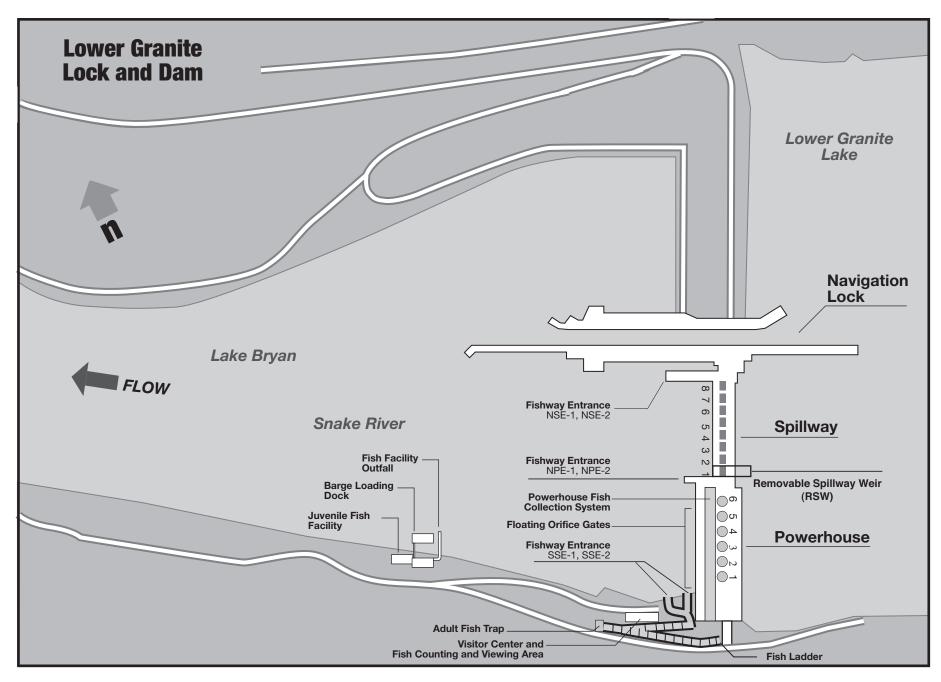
Lower Granite Lock and Dam general site plan.
